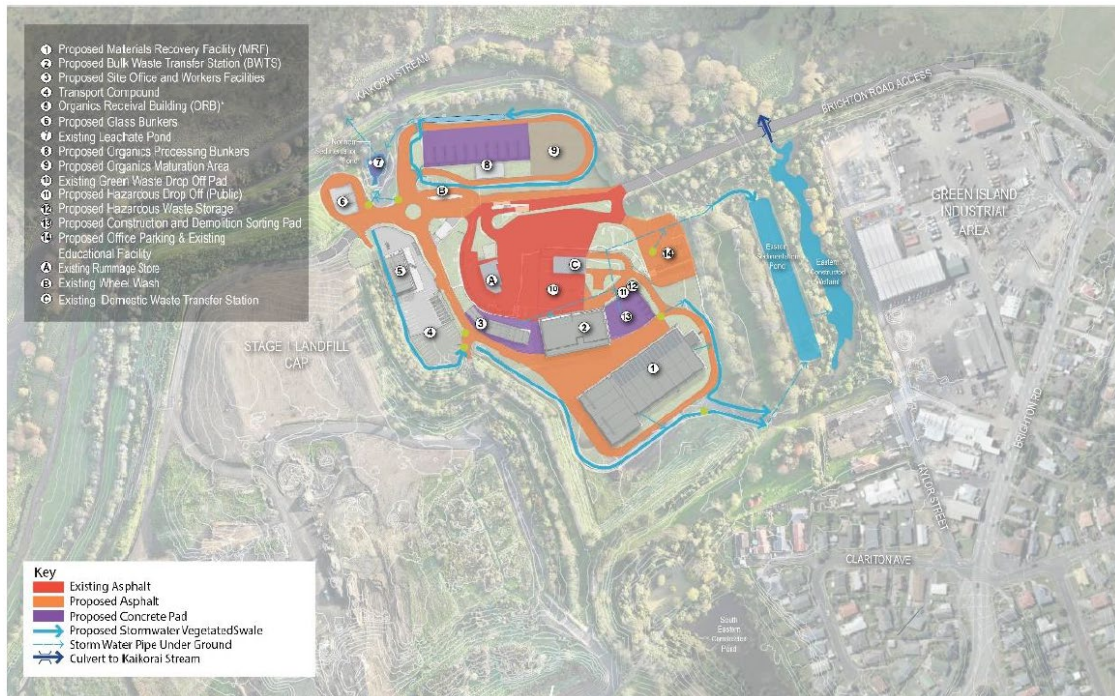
Overview of proposed stormwater management system. Source: RM24.143 application.
